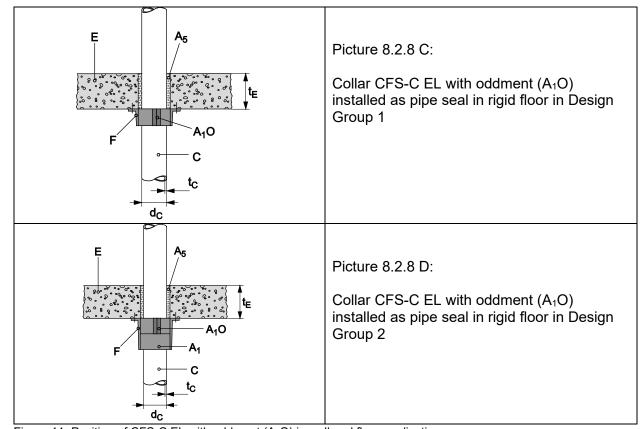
Position of CFS-C EL with oddment (A<sub>1</sub>O) in wall and floor application
